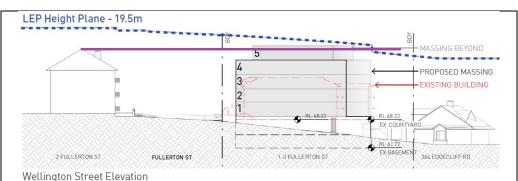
Height of roof ridge of No. 2 Fullerton in comparison to proposal (indicated purple)
